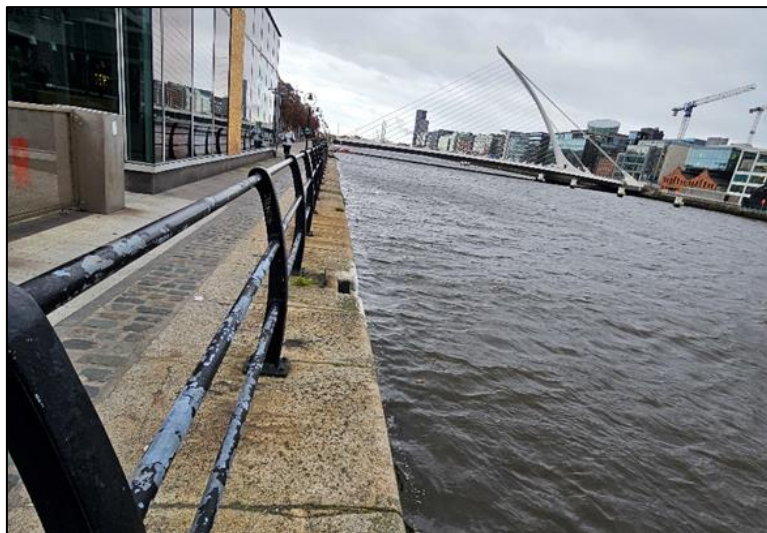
Existing access to George's Dock at Area A [J.McC 29/01/2026]
